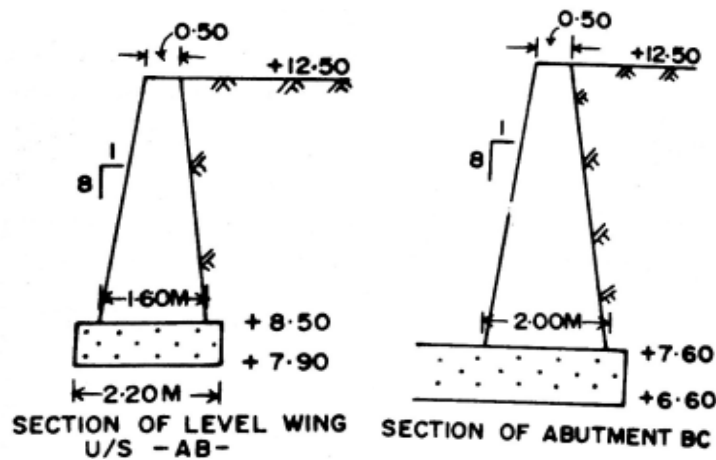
(b) & (c) Cross sections of abutment and wing wall
